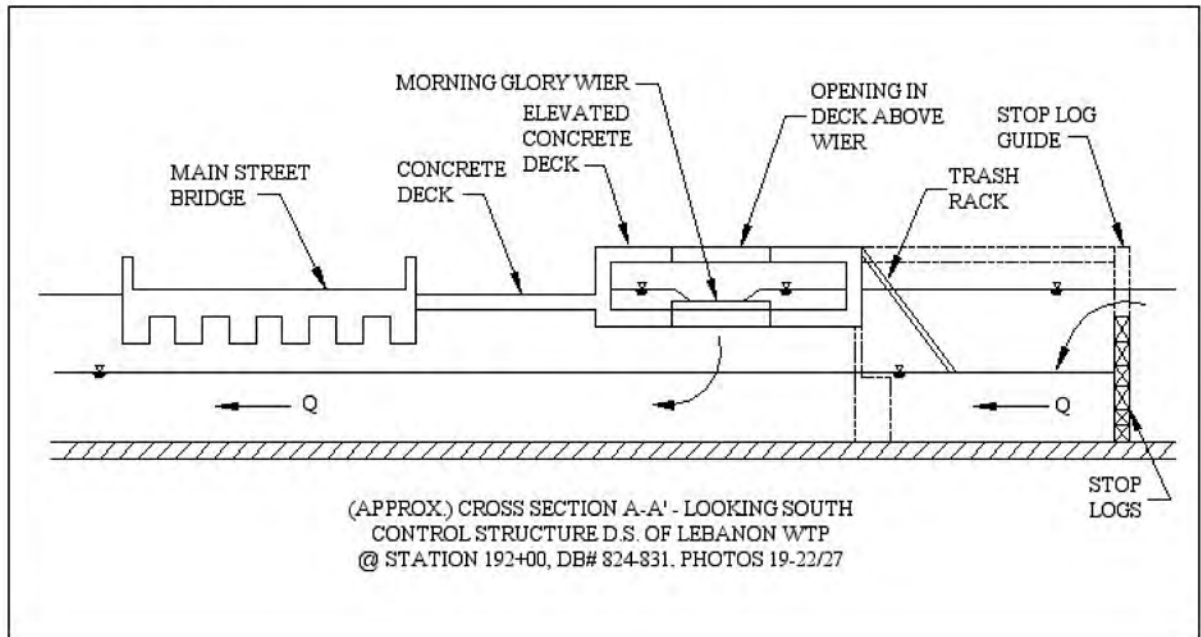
Lebanon Hydropower Intake and WTP Diversion Structure, Section A-A' (Not to Scale)
